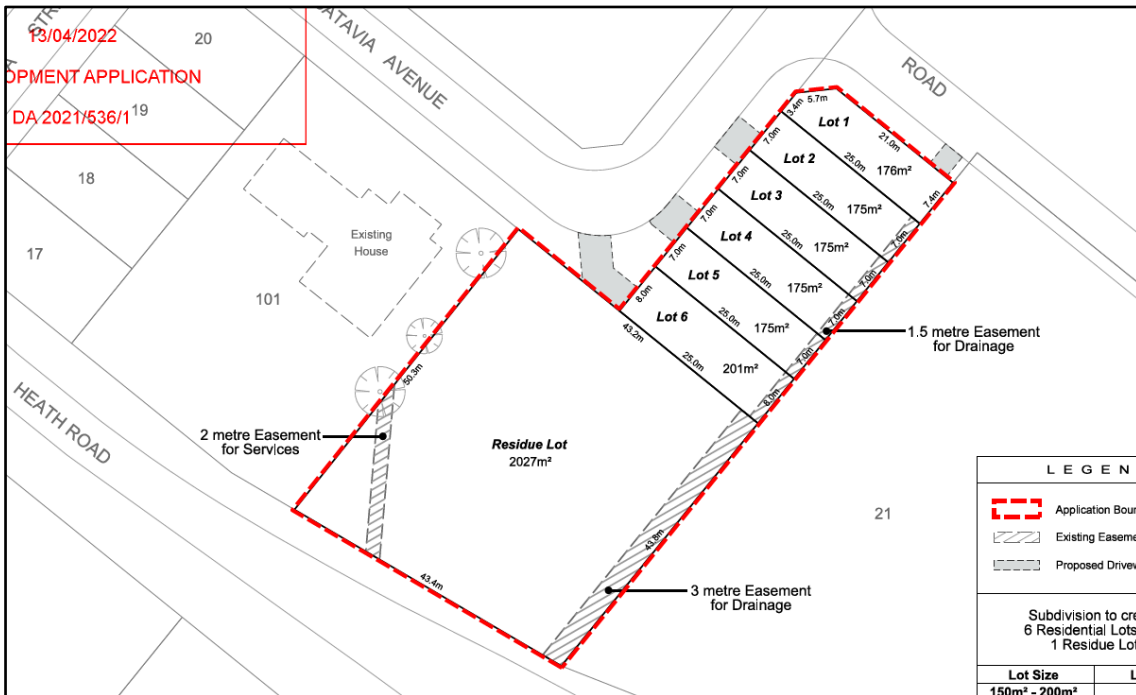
Site plan indicating development site (labelled “residue lot”), with six attached dwellings / lots to be created at the northern end of the site (currently under construction)
